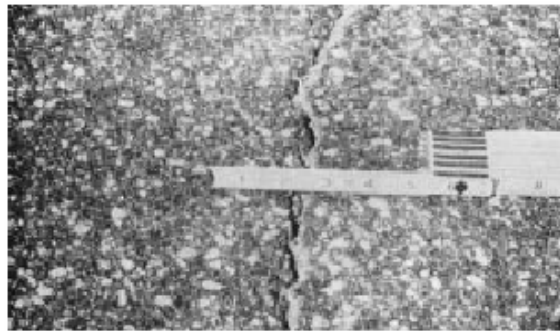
Reflection Cracking (Iowa Design Guide, APAI 2003)
